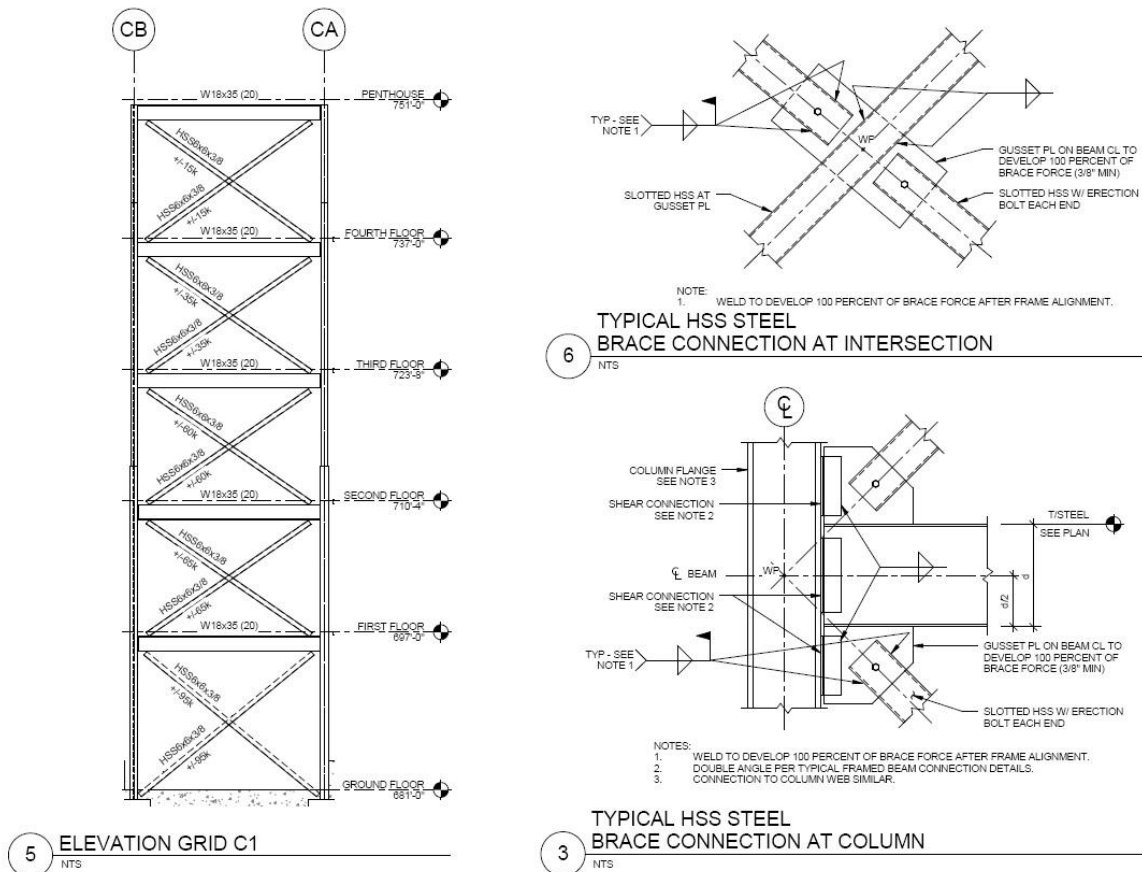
Typical lateral HSS brace frame (left). Typical HSS steel brace connection at intersection (upper right). Typical HSS steel brace connection at column (lower right). Details courtesy of Cannon Design.
